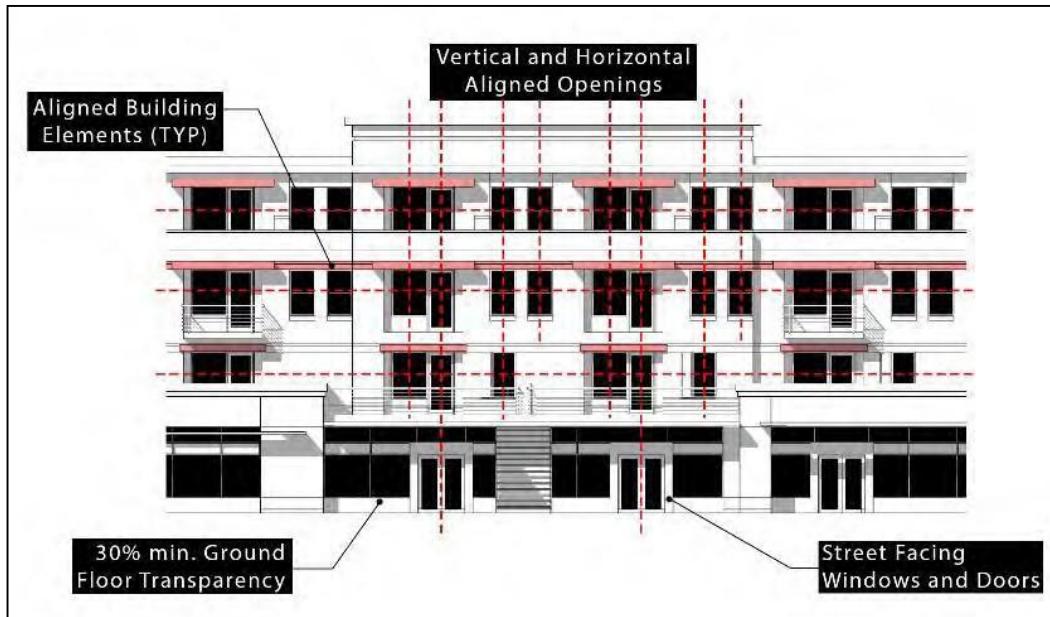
Example of 30% window transparency on a mixed-use building facing a public roadway
